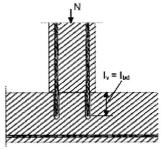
rebar connection for components stressed primarily in compression; rebar is stressed in compression
